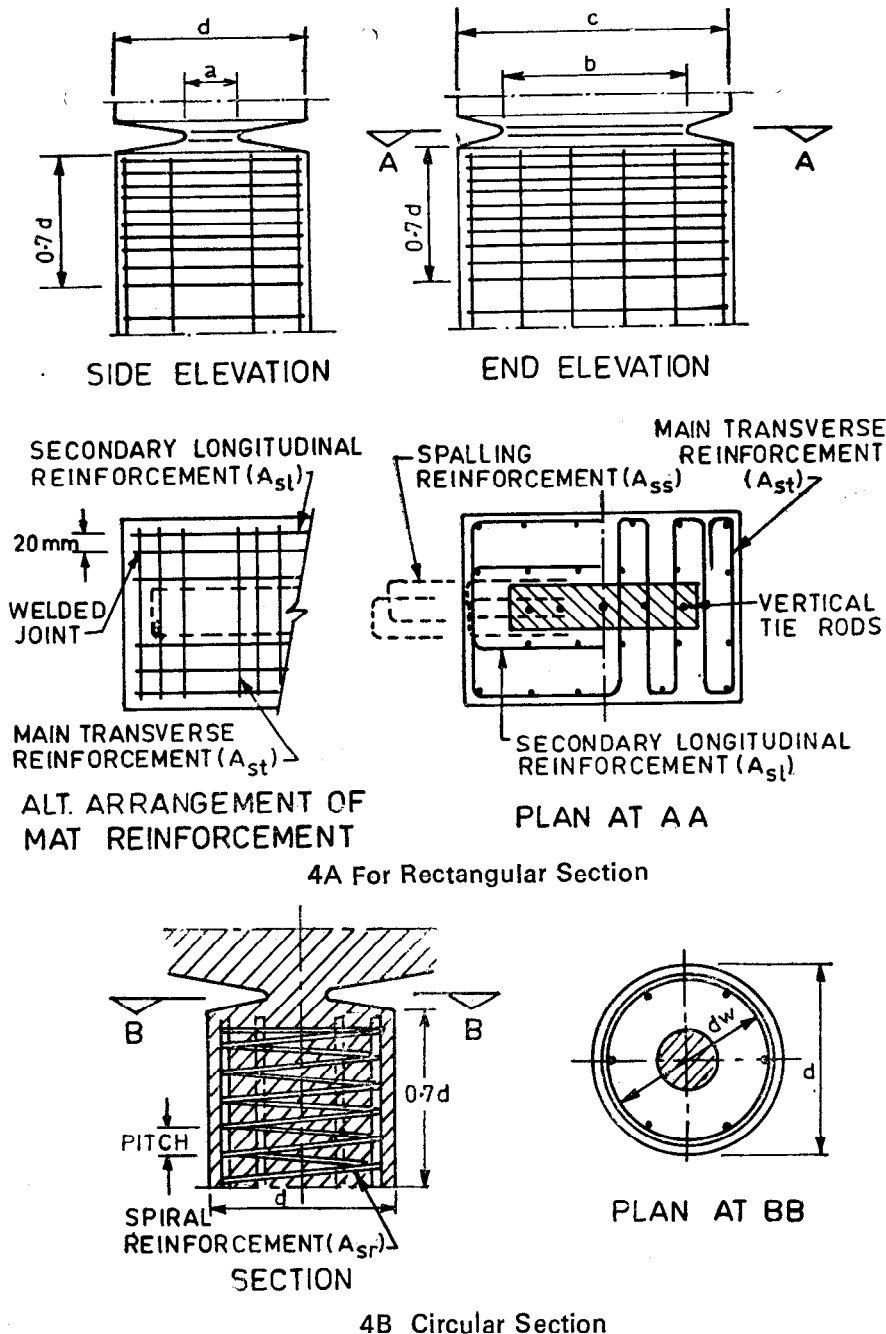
TYPICAL ARRANGEMENT OF HINGE REINFORCEMENT
